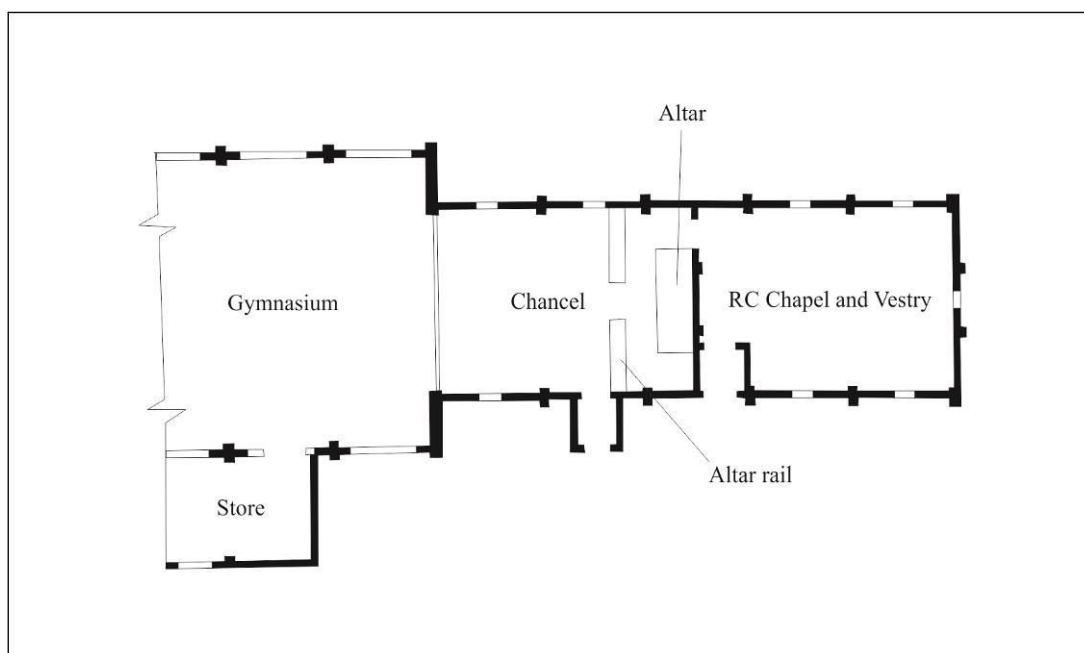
Gymnasium with church extension – adapted from Air Ministry drawings 16428/40 and 15424/41 (not to scale).
